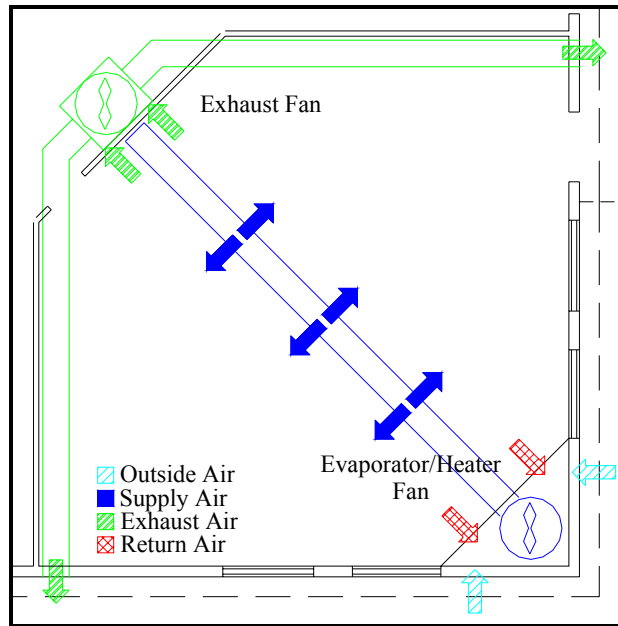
Hanna Ranch Classroom HVAC Equipment Layout.
